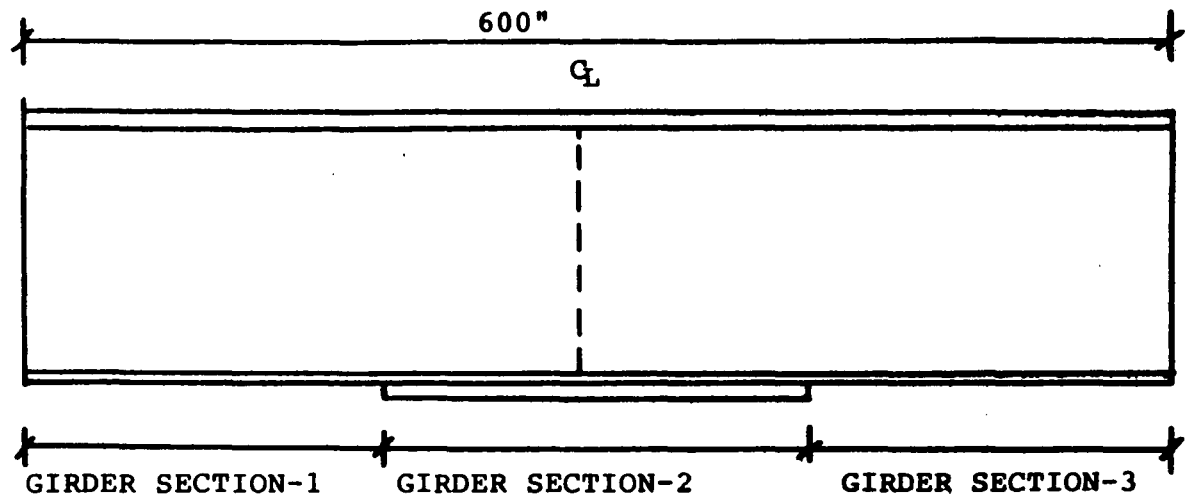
AASHTO 3B Bridge, Girder Elevation
